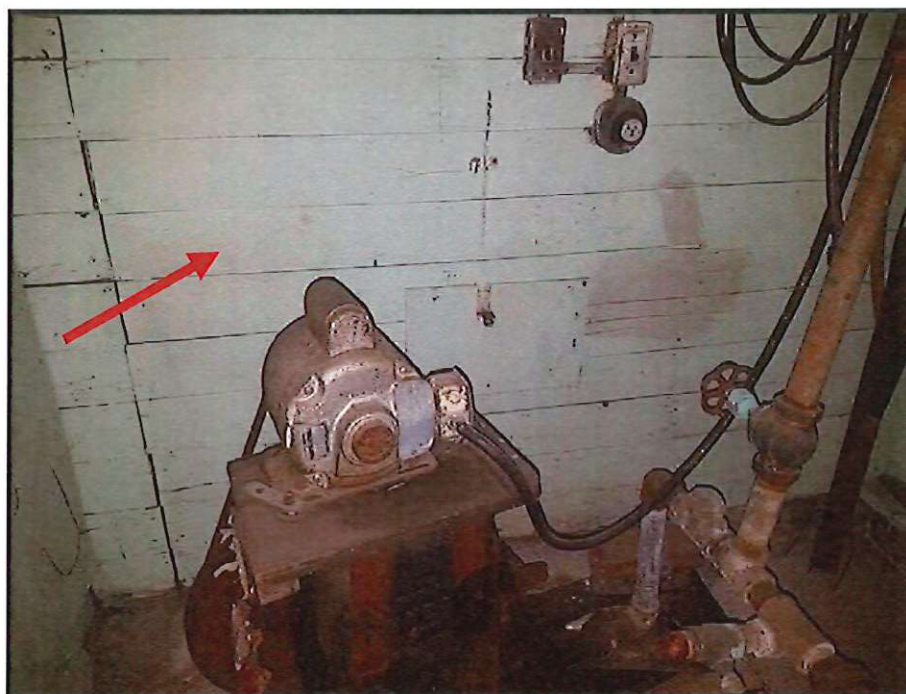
WHITE LEAD-BASED PAINT (BENEATH GREEN PAINT) ON WOOD WALL BOARDS, TANK ROOM
